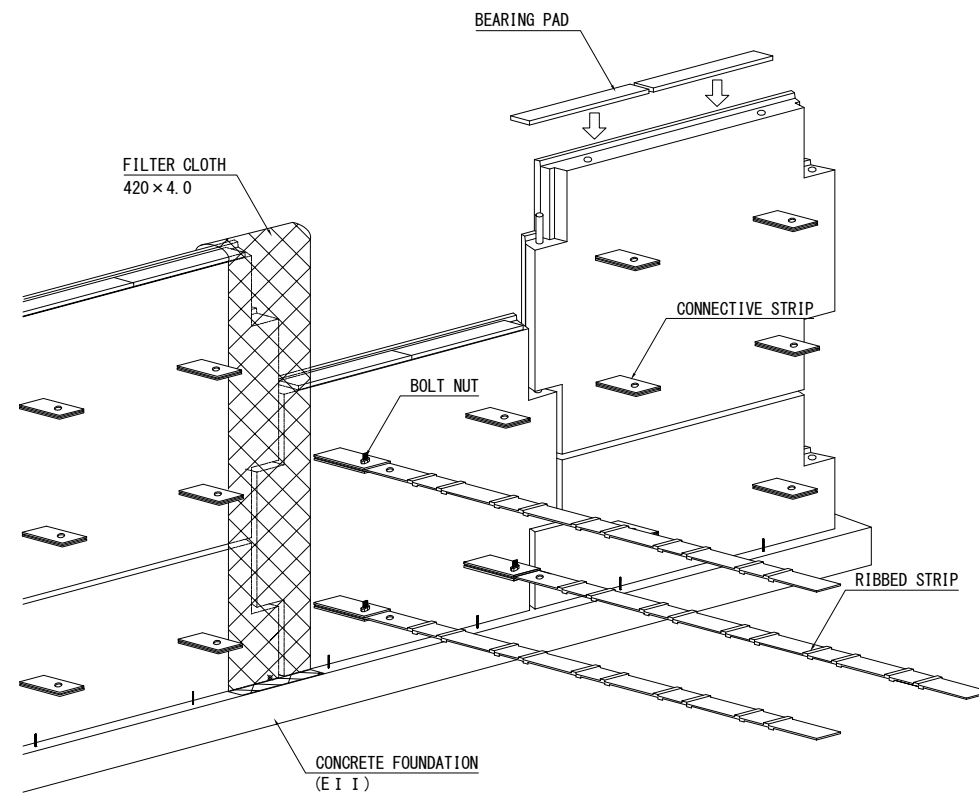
# DETAIL OF MECHANICALLY-STABILISED EARTH WALL(4)
